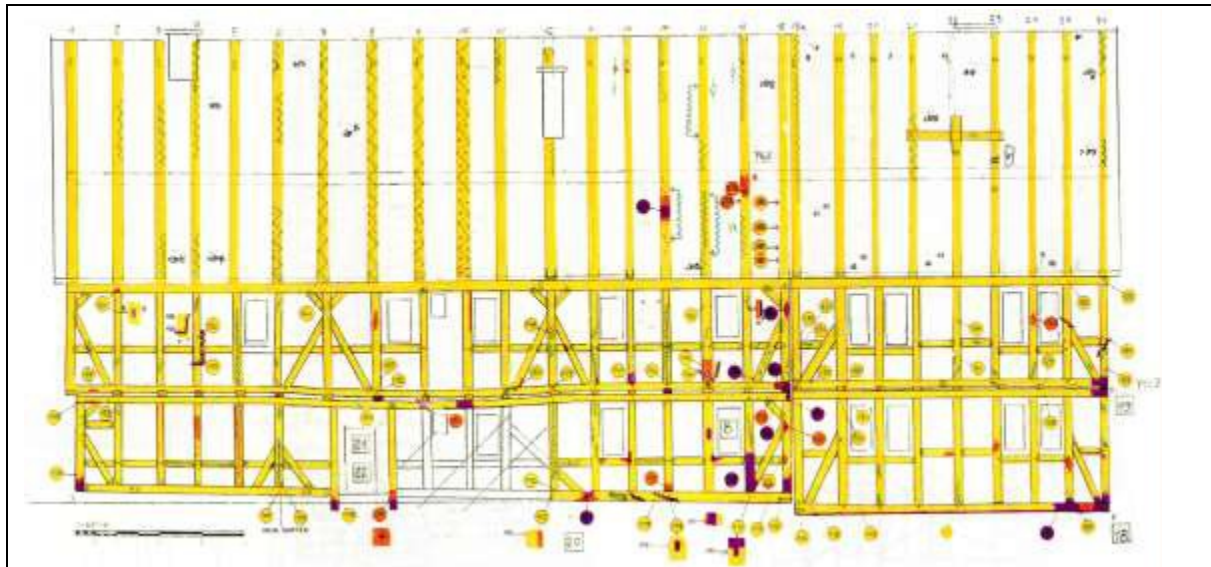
Overview sketch with color coded condition inventory showing the complete facade of a historical building and all rafter of the roof structure.
